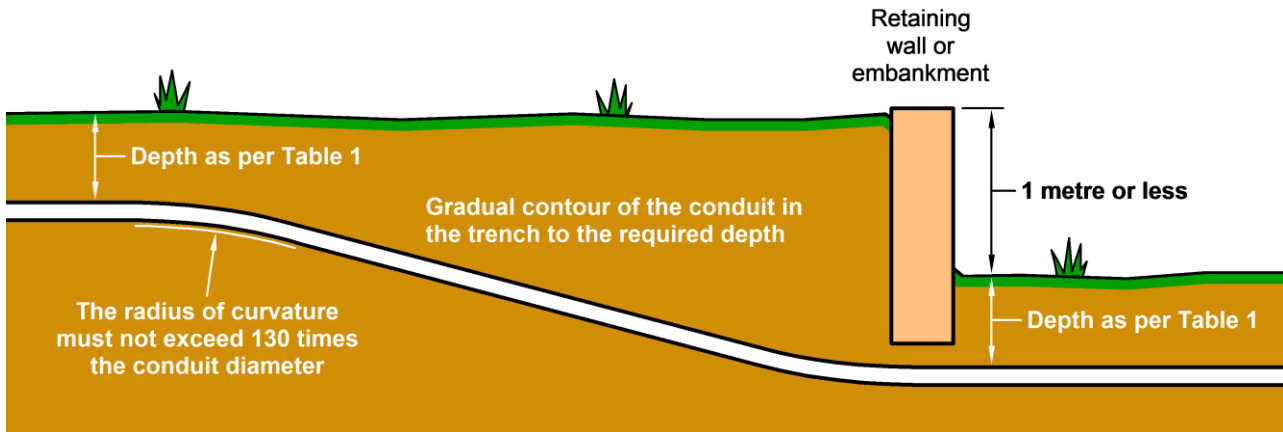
Trenching/Conduit Arrangement with a retaining wall of 1 m or less
